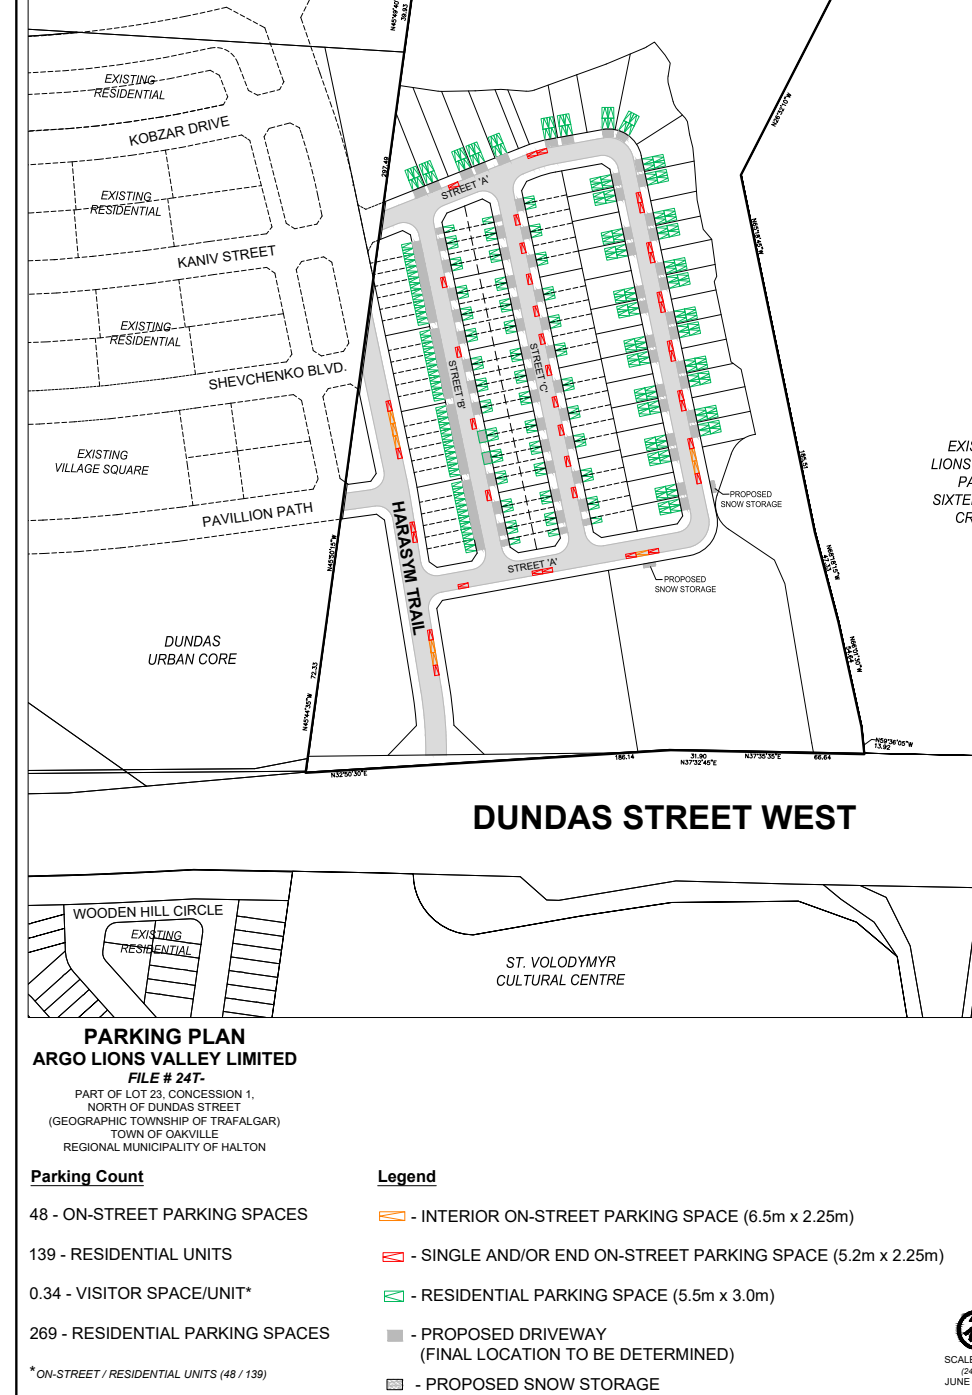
Parking Plan (source: GSAI, June 27, 2025)
